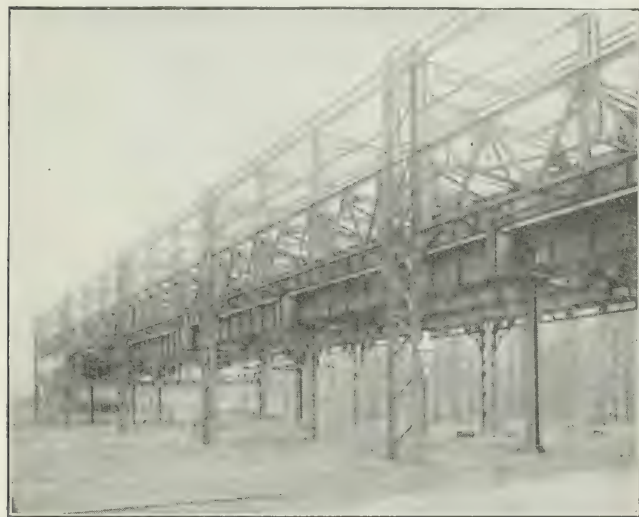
STEEL FRAME OF PELHAM PARKWAY STATION, WHITE PLAINS ELEVATED R.R.
